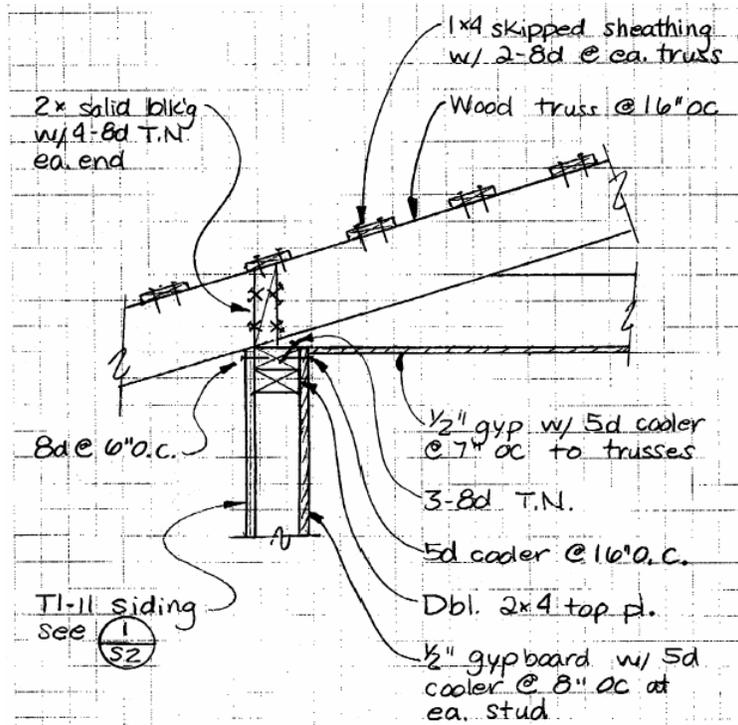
Index building 6 top of exterior wall (detail 3-S2)
